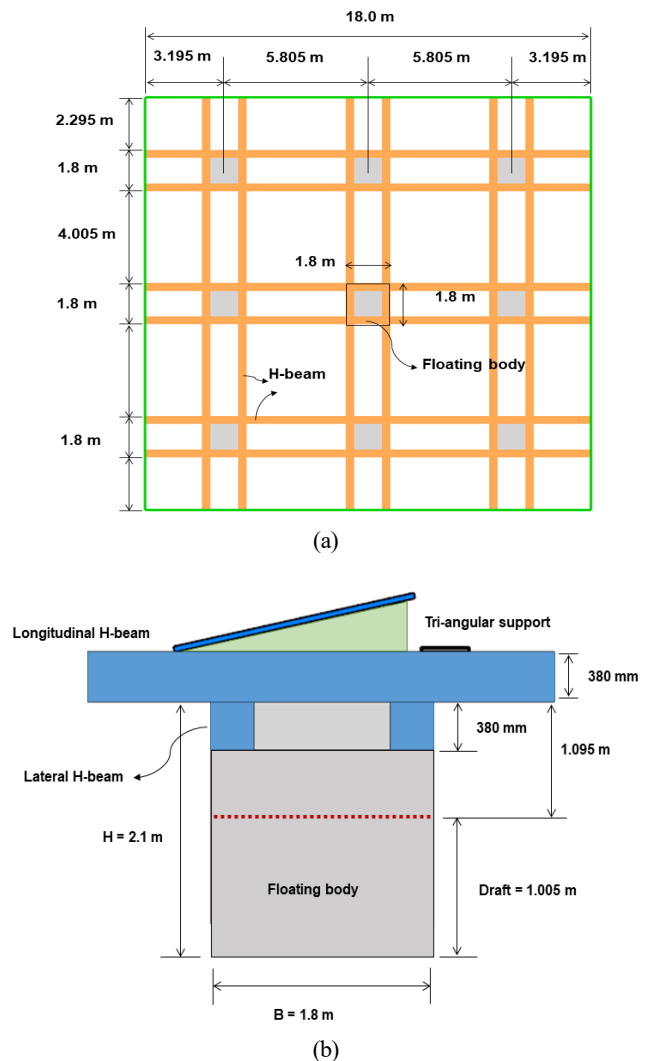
Dimensions of unit structure: (a) top view of unit structure; (b) side view of buoy and beam connector
